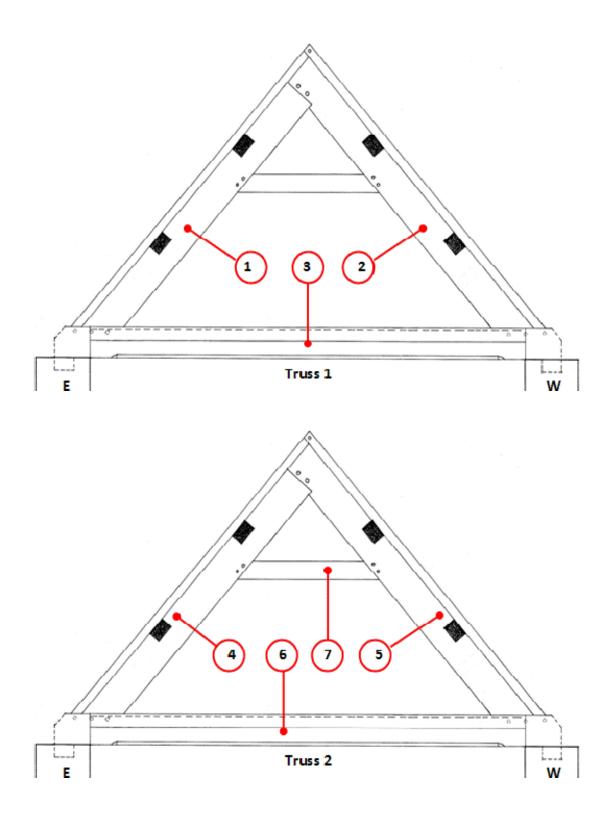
/b: Drawing of the roof trusses to show sampled timbers (after NEVAG forthcoming)
